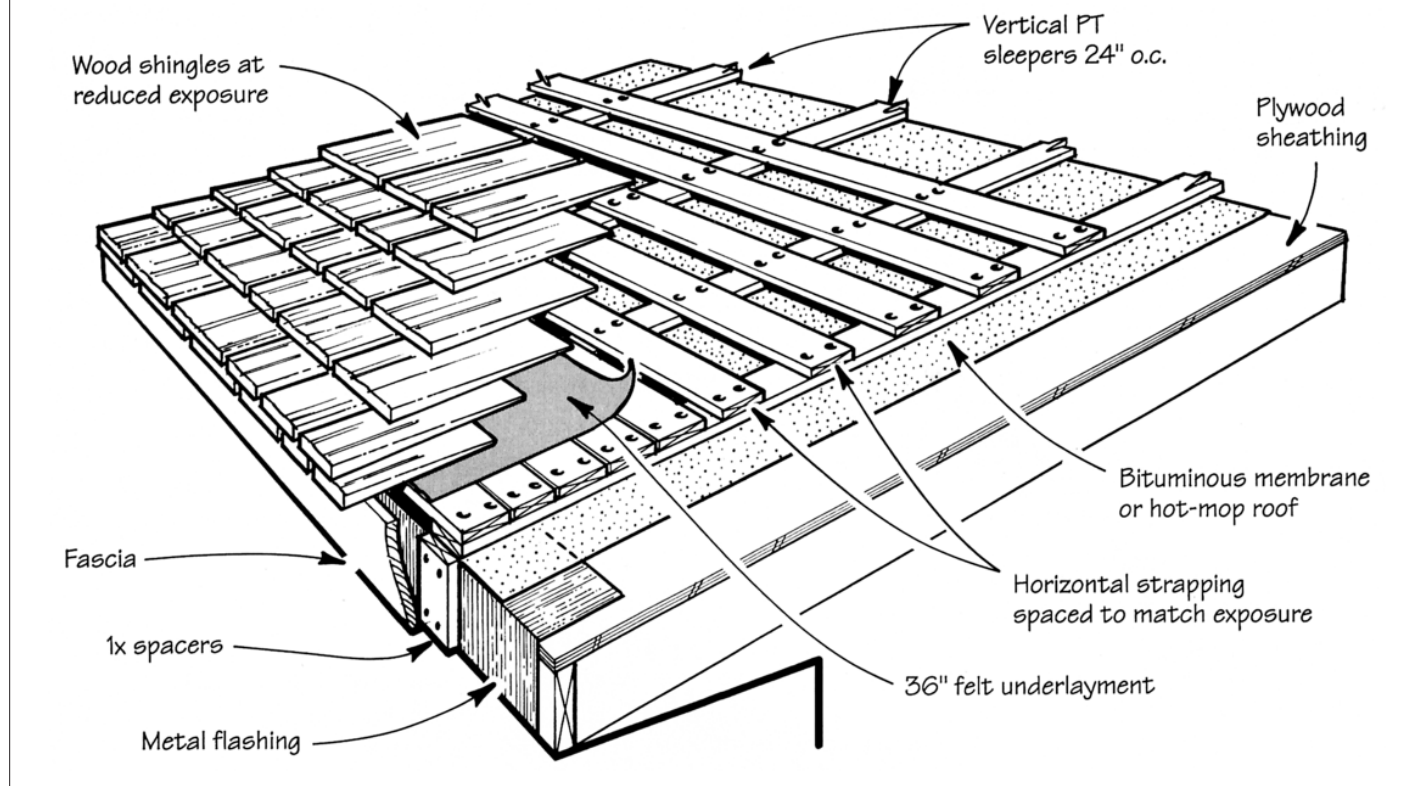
On shallow slopes, install wood shingles and shakes over a watertight subroof and a framework of pressure-treated strapping. The fascia is spaced out from the metal flashing at the eaves to allow any water that gets under the roofing to drain from the subroof.
